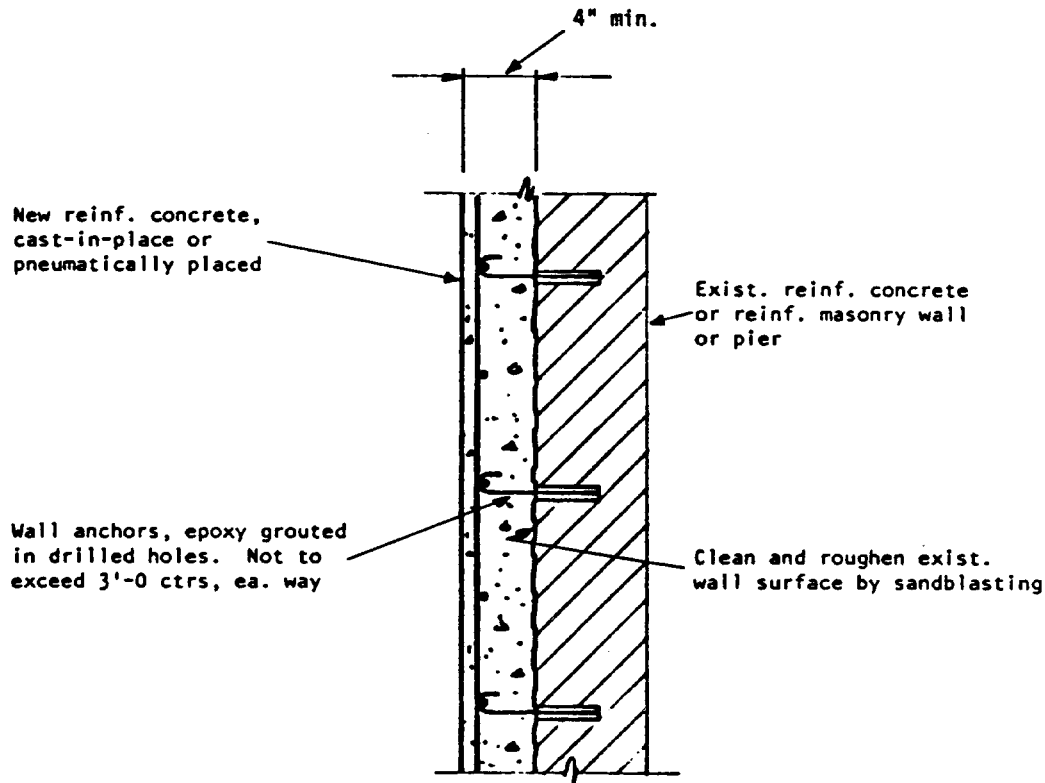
Strengthening of existing reinforced concrete or masonry walls or piers
